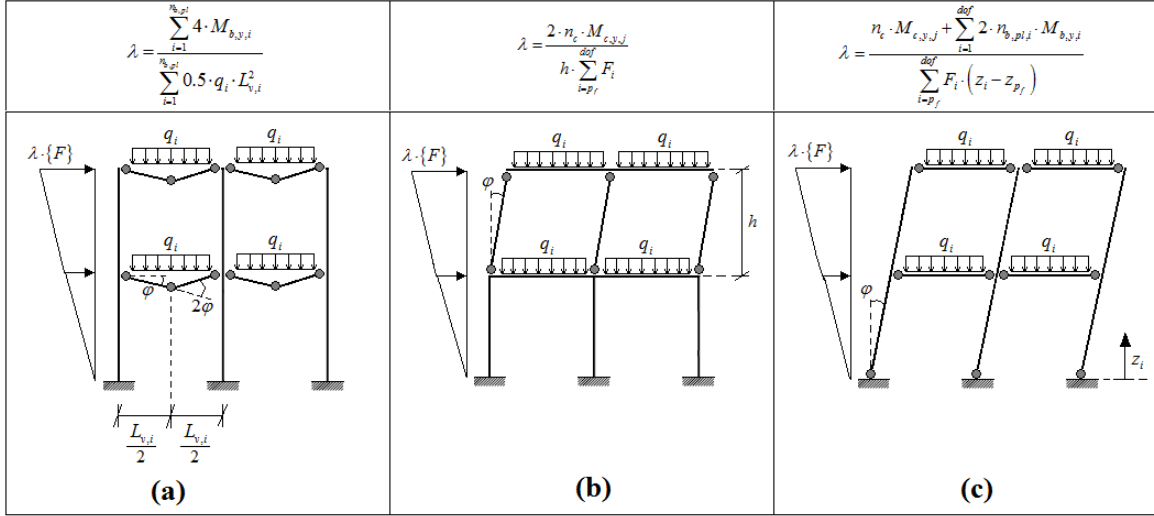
Beam (a) floor (b) and multistory (c) collapse mechanism and associated collapse multiplier of a RC building
